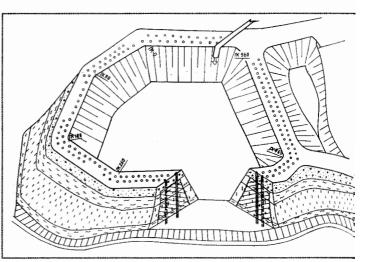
Arrangement of grout holes around tailing pond No. 1 of the Nicopol Ferroalloy Fat
